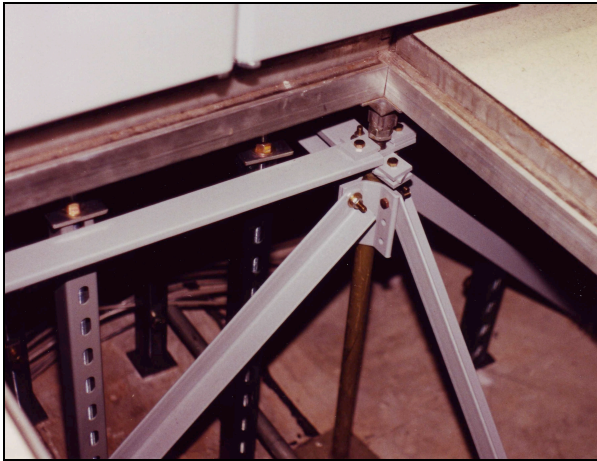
This shows the pedestal top arrangement and the anchoring method of the equipment.
